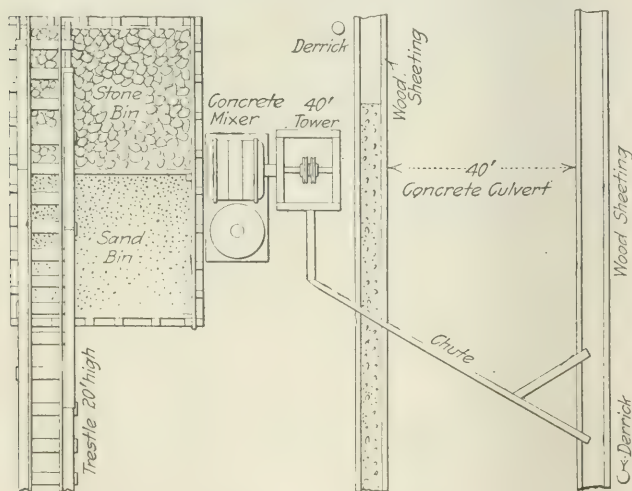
CONCRETE PLANT FOR 40-FT. CULVERT AT RICHLAND CREEK, S. C.
